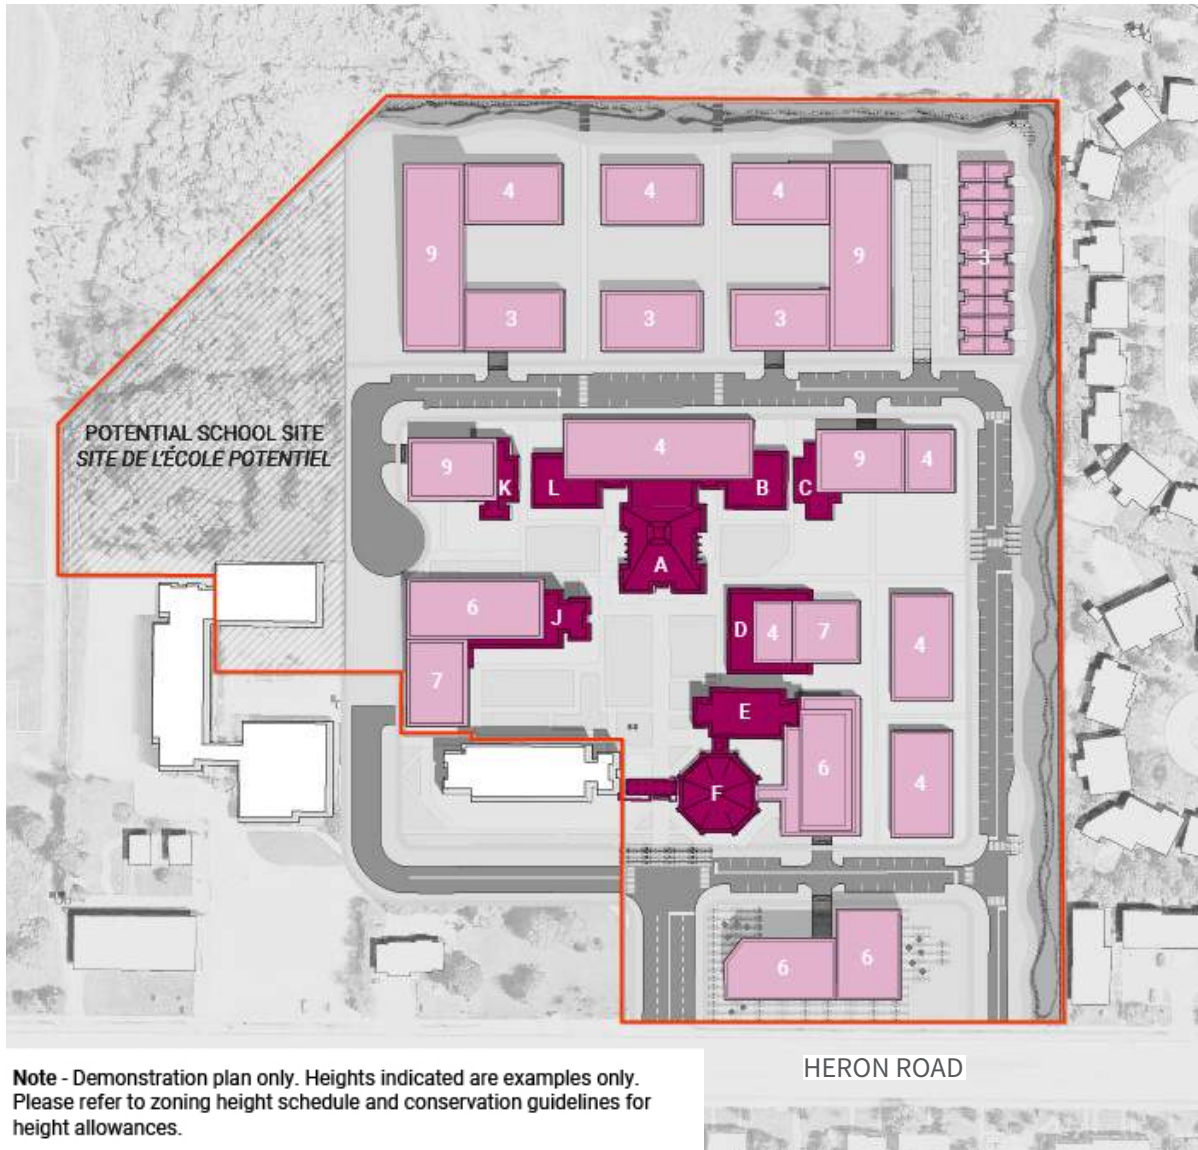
Alternative demonstration plan showing more new construction within the historic campus (Stantec, 2024)
